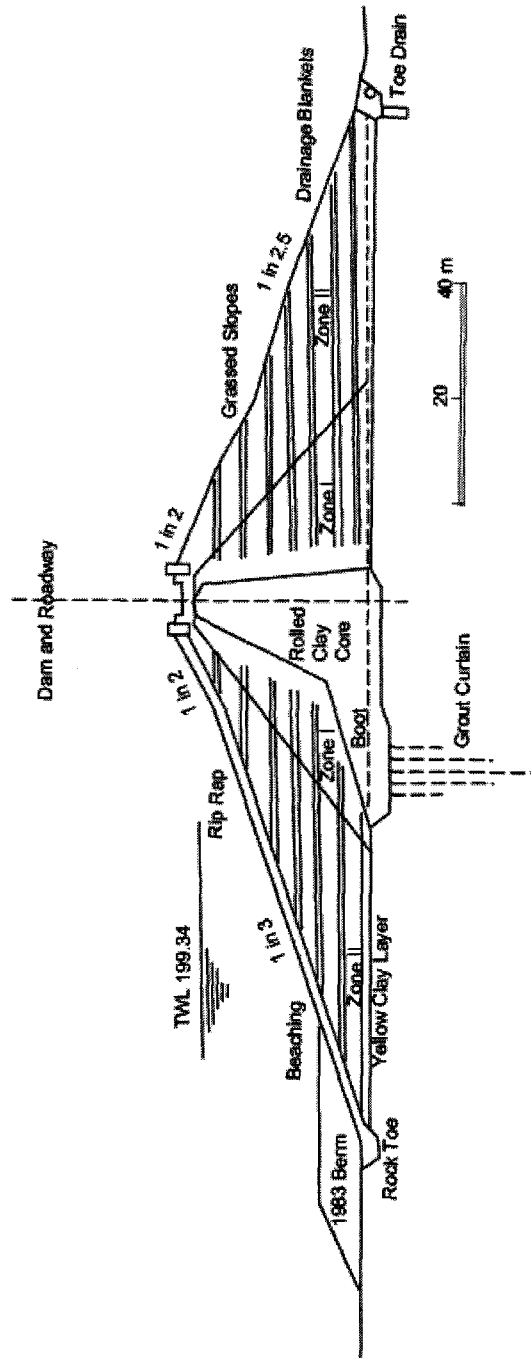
Typical cross-section of the Carsington Dam, Chen [8]
